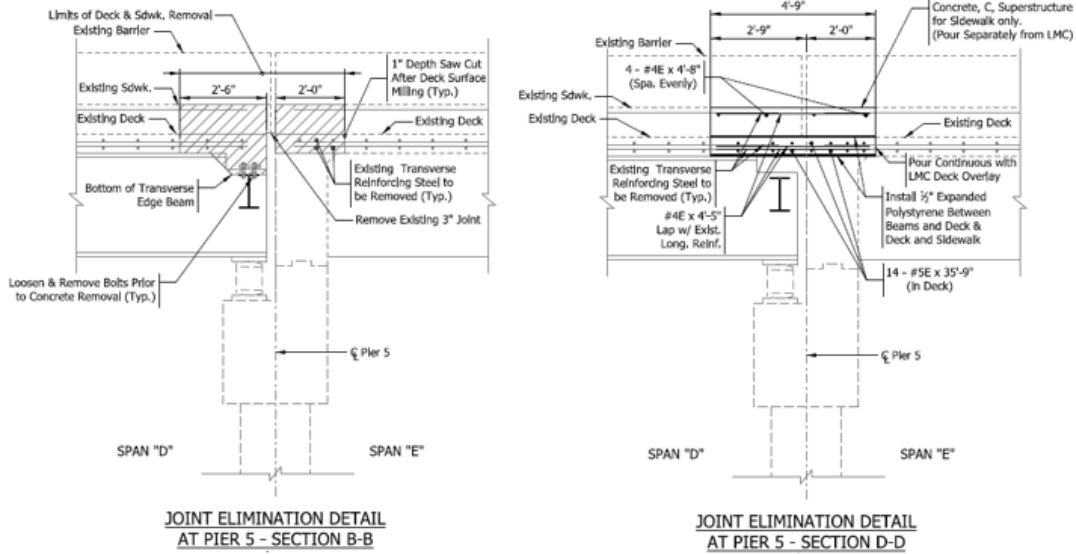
Link slab detail (Hillcrest Road over US-50)
